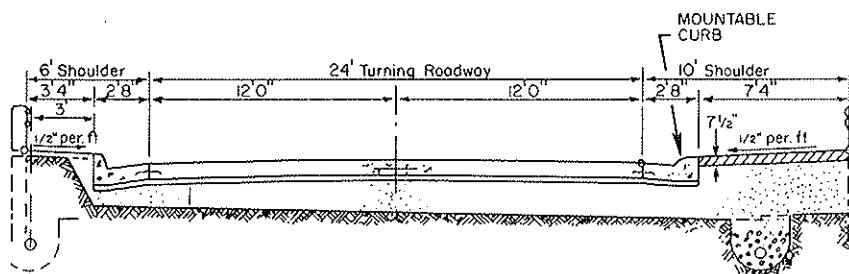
Cross section of roadway from ramp site shown in Figure 13.
